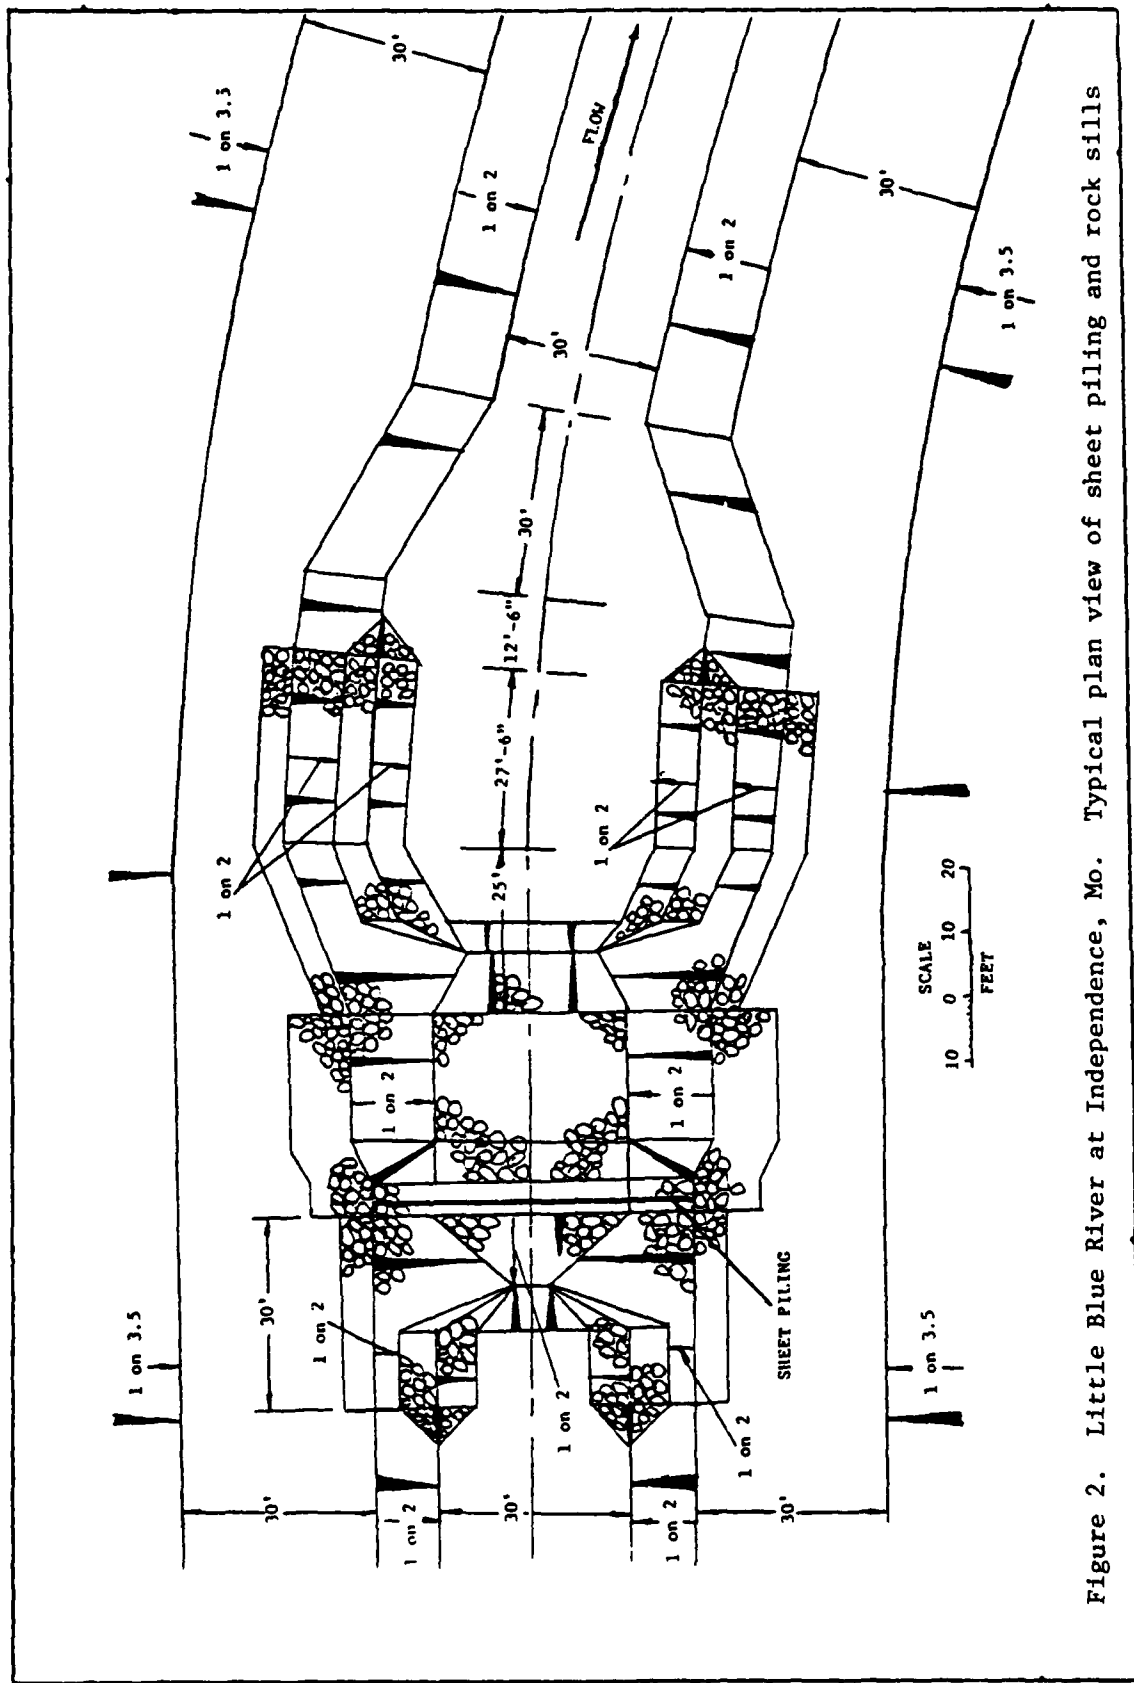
Little Blue River at Independence, Mo. Typical plan view of sheet piling and rock sills
